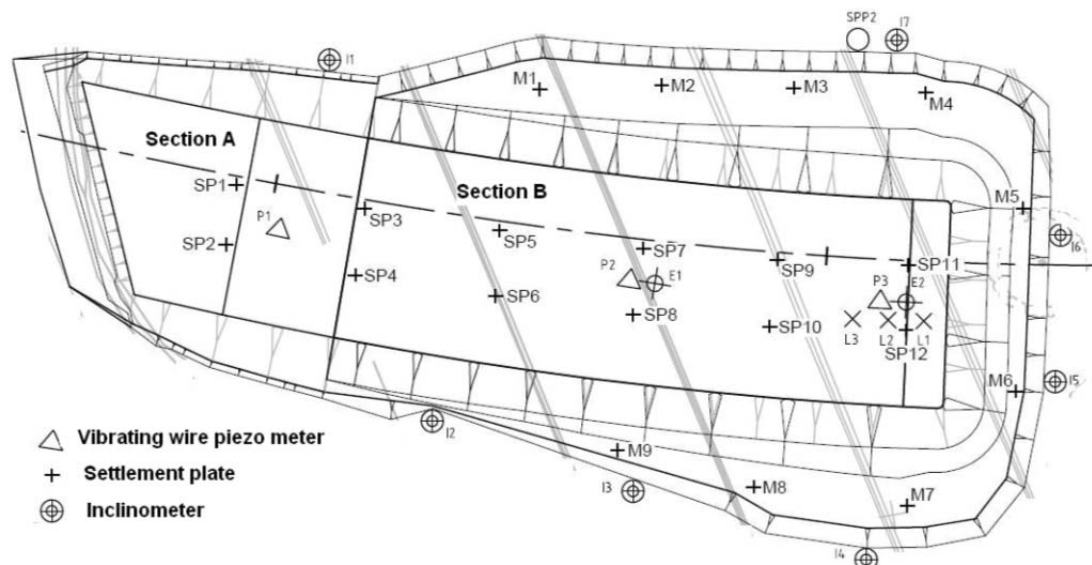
Instrumentation layout for the test embankments at Ballina Bypass (Indraratna et al. 2009).
